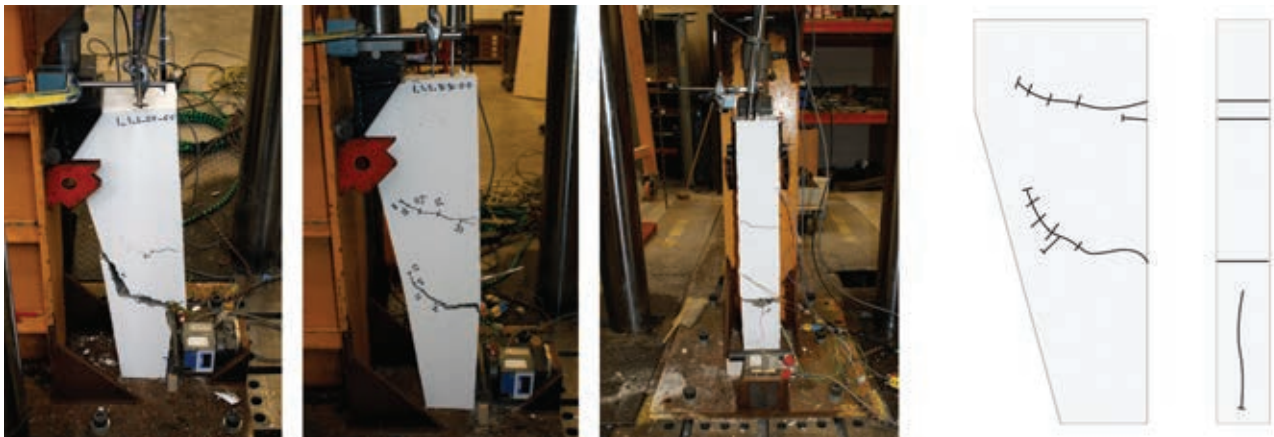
Typical specimen failure mode (l) and crack pattern (r).
